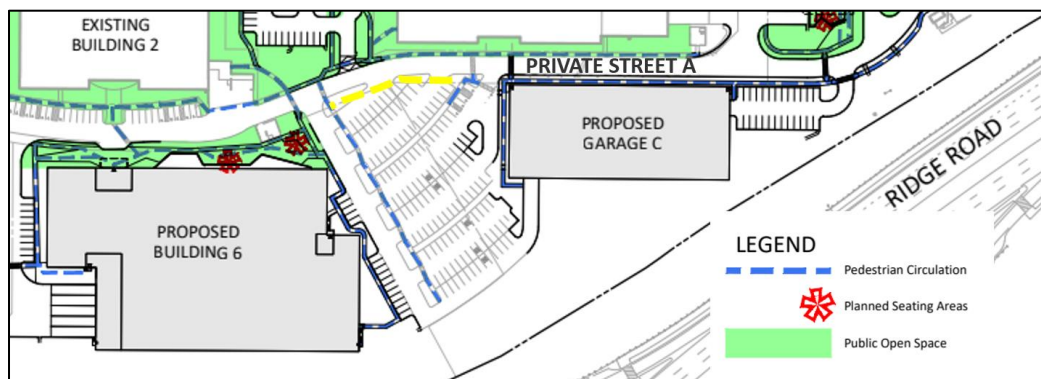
Recommended Sidewalk Connection (highlighted in yellow)
